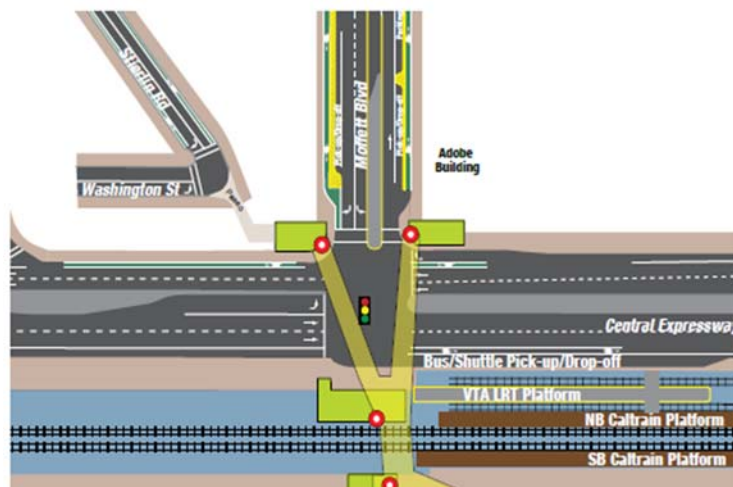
B- Plan view of intersection of Moffett Boulevard/Central Expressway
